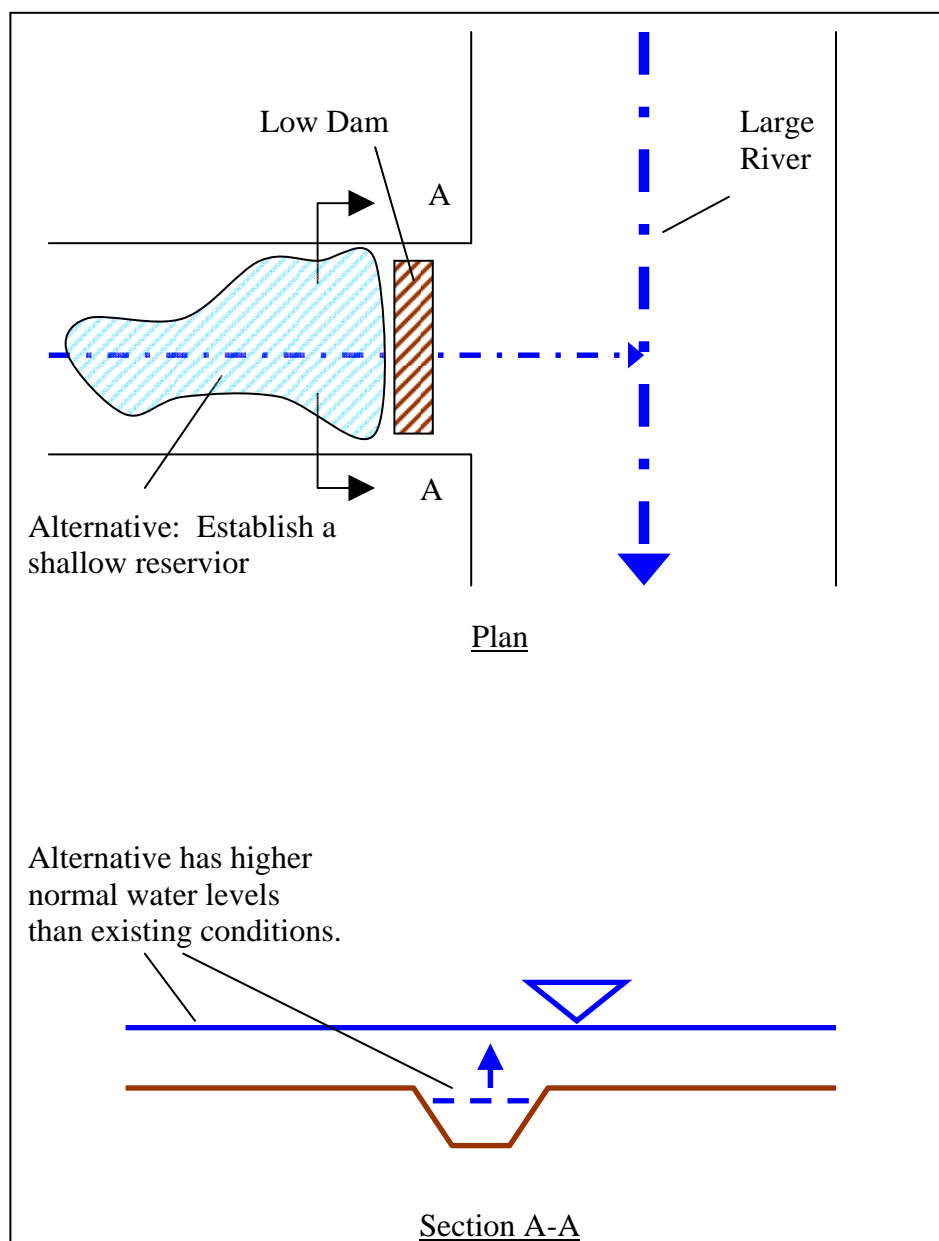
Uncontrolled Site with Independent Tailwater, Alternative – Install Dam.
